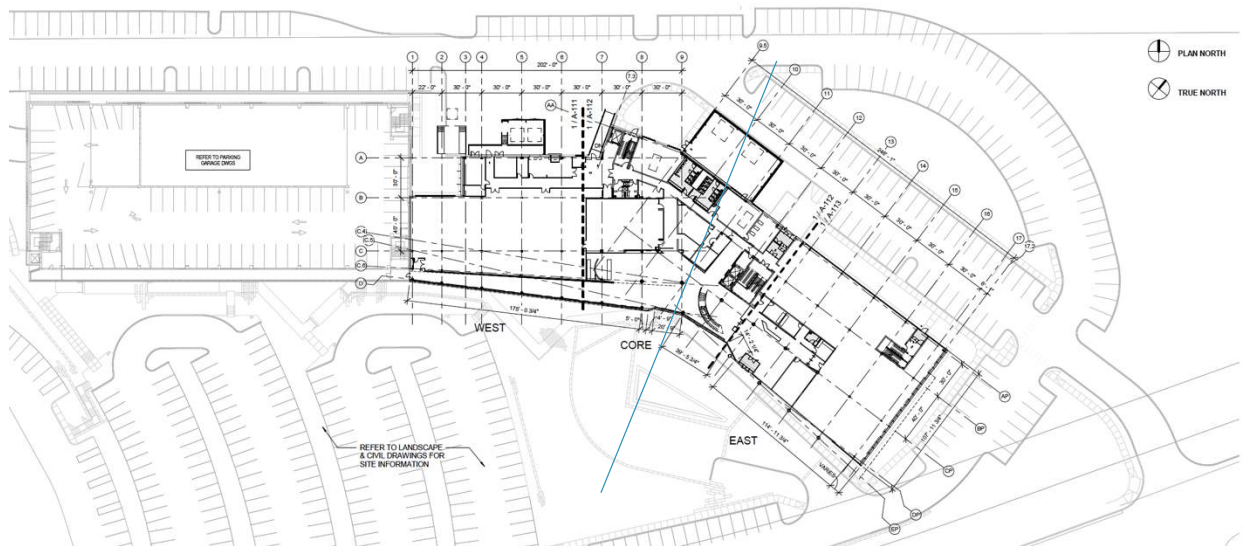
Site plan of building, illustrating West, Core and East, with mirror line of 22.5° .
